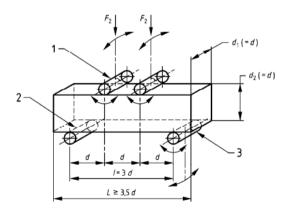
Arrangement of loading of test specimen (BS EN 12390-5) [18]
